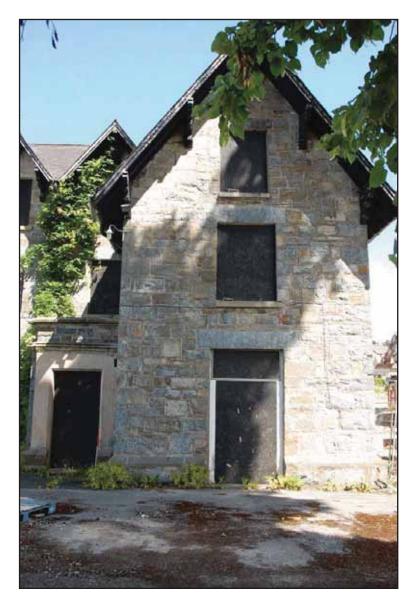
Headmaster's Building - south elevation, projecting gable detail. Scale: 1.0m
